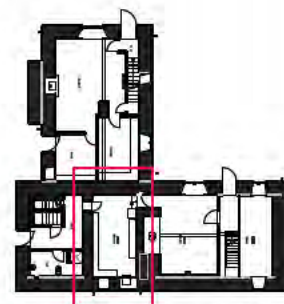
Plan of slate slabs found below concrete floor within the former kitchen
